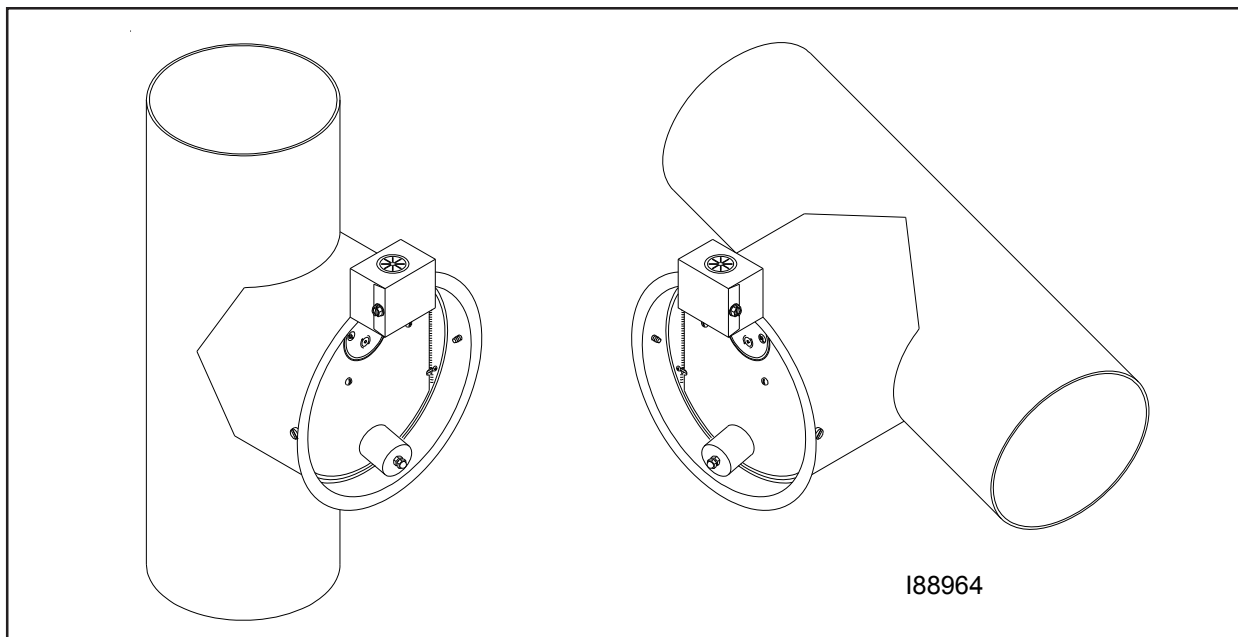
K - Stack Safety Switch Installed on the Barometric Damper
